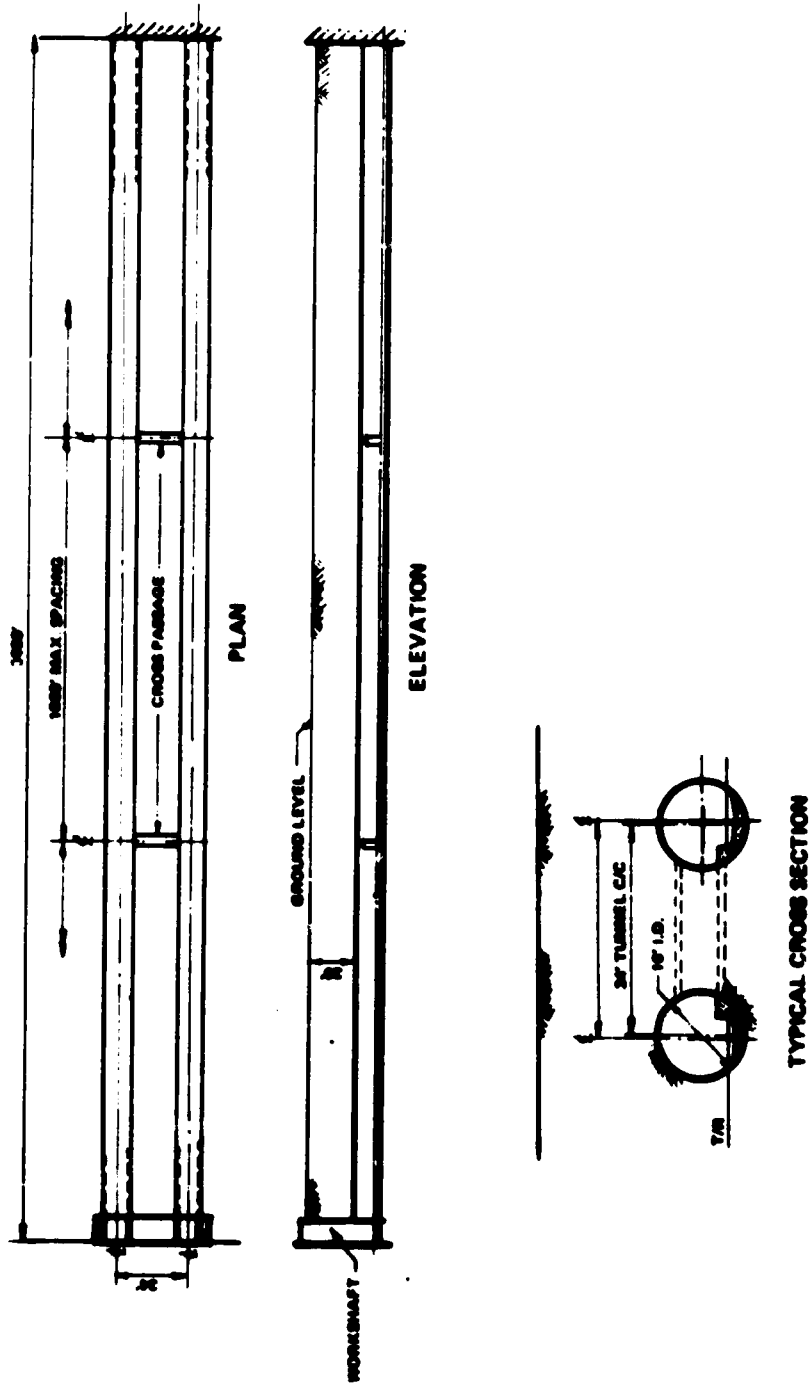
Plan and Elevation for the Model Free-Air-Driven Tunnel Based on 3,000 Ft of Twin Tunnel
